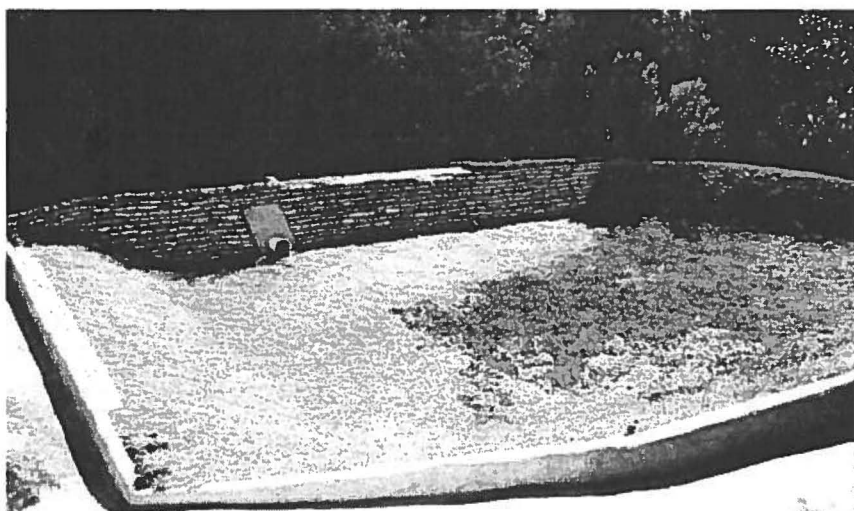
Typical office building on-line flood detention facility near RR 2222
